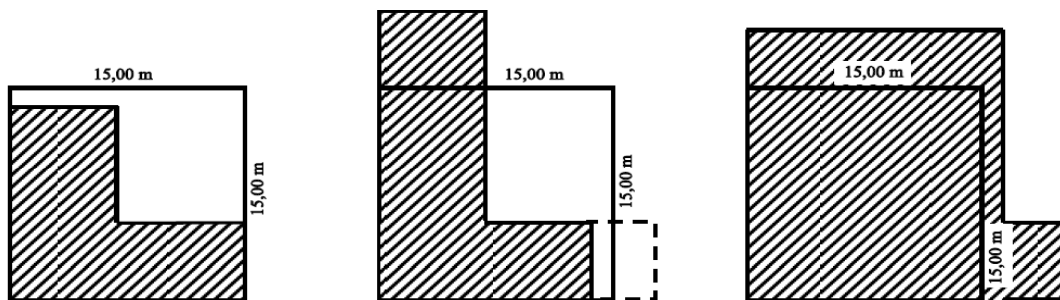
German WSVO 1977 Ground Plan Requirements
